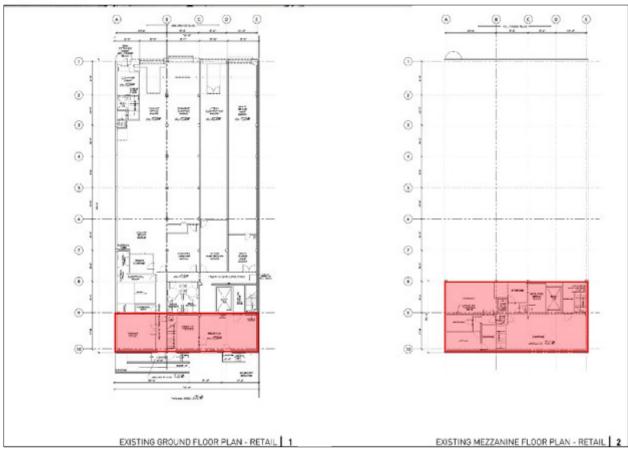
Location of Demolition, 6630-6636 Hollywood Boulevard (Building 7)
